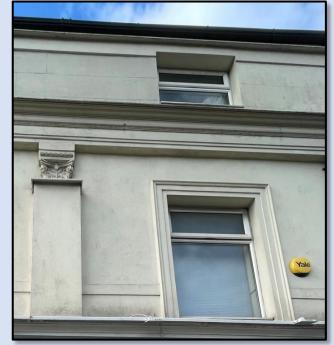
Externally applied insulation and render applied externally to the external walls of Stone Boy House. (Author, 2023)
